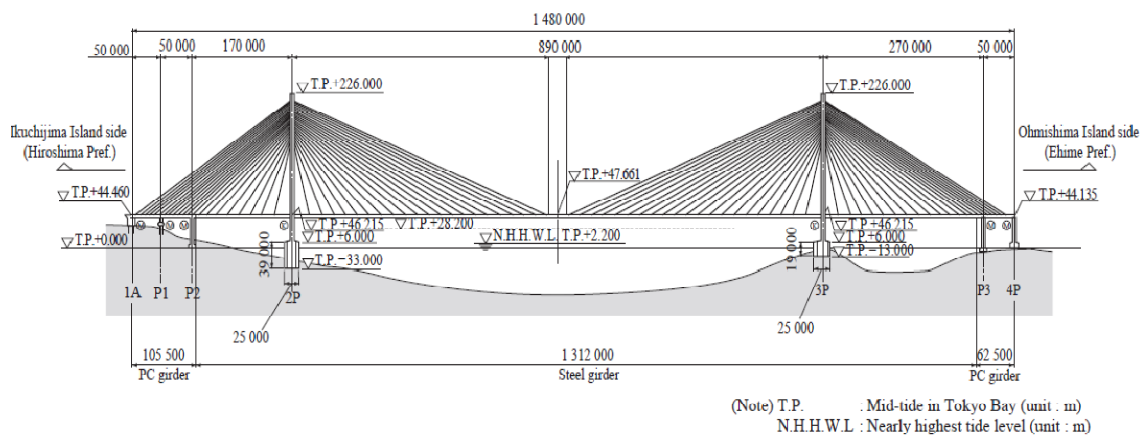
General arrangement Tataru Cable-Stayed Bridge
